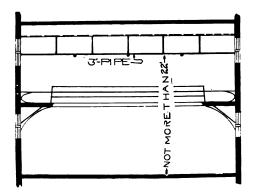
Standard Fittings and Methods recommended for attaching apparatus beams to concrete and enclosed girders.
